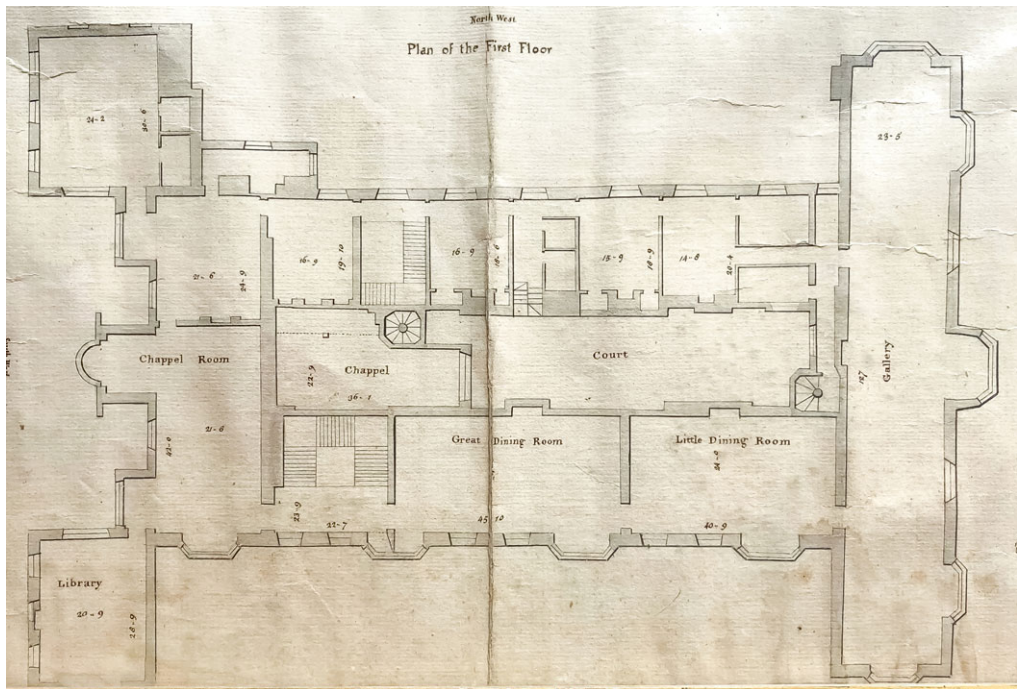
First-floor plan of Bramshill in 1764, by William Chapman. *Plan.* © Bramshill House Collection, reproduced with permission.
